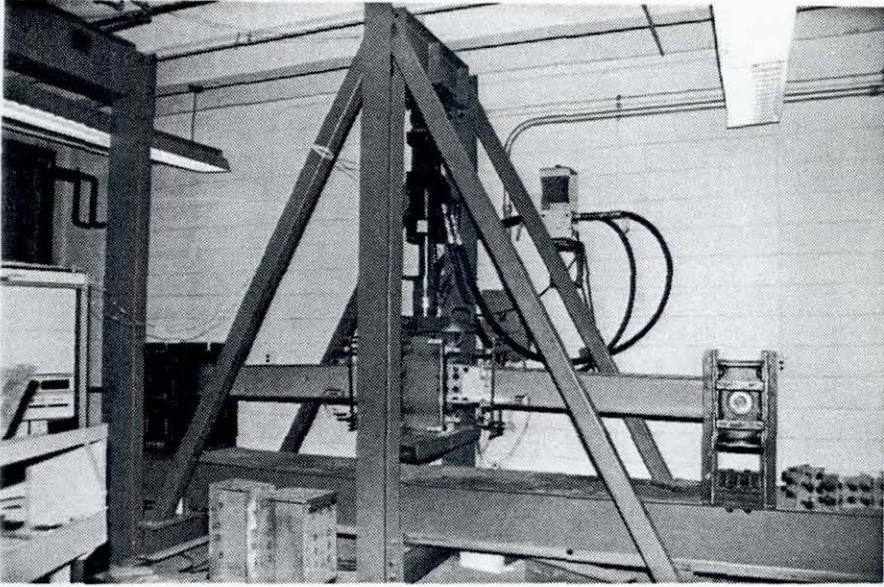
LOADING FRAME AND TEST SET-UP
